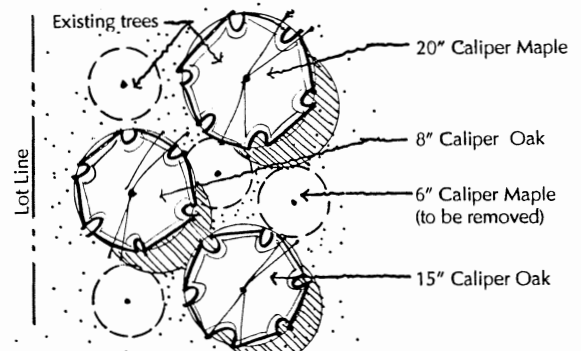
EXISTING TREES/TREE SAVE AREA
